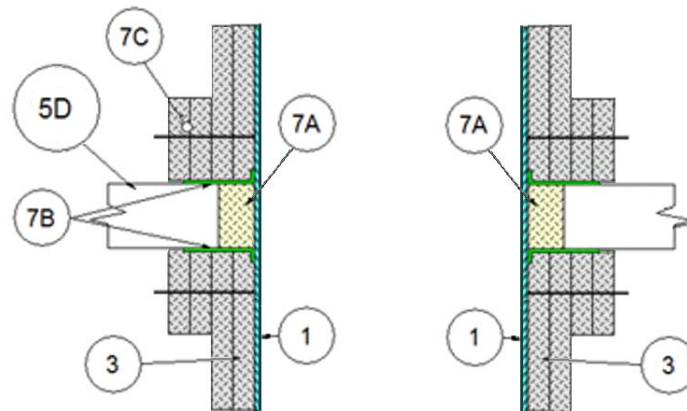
Penetration Assembly, Duct Through Floor/Ceiling
